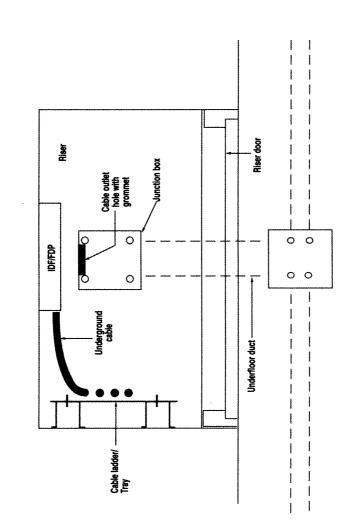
FLOOR DUCT EXTENDED INTO TELEPHONE RISER
